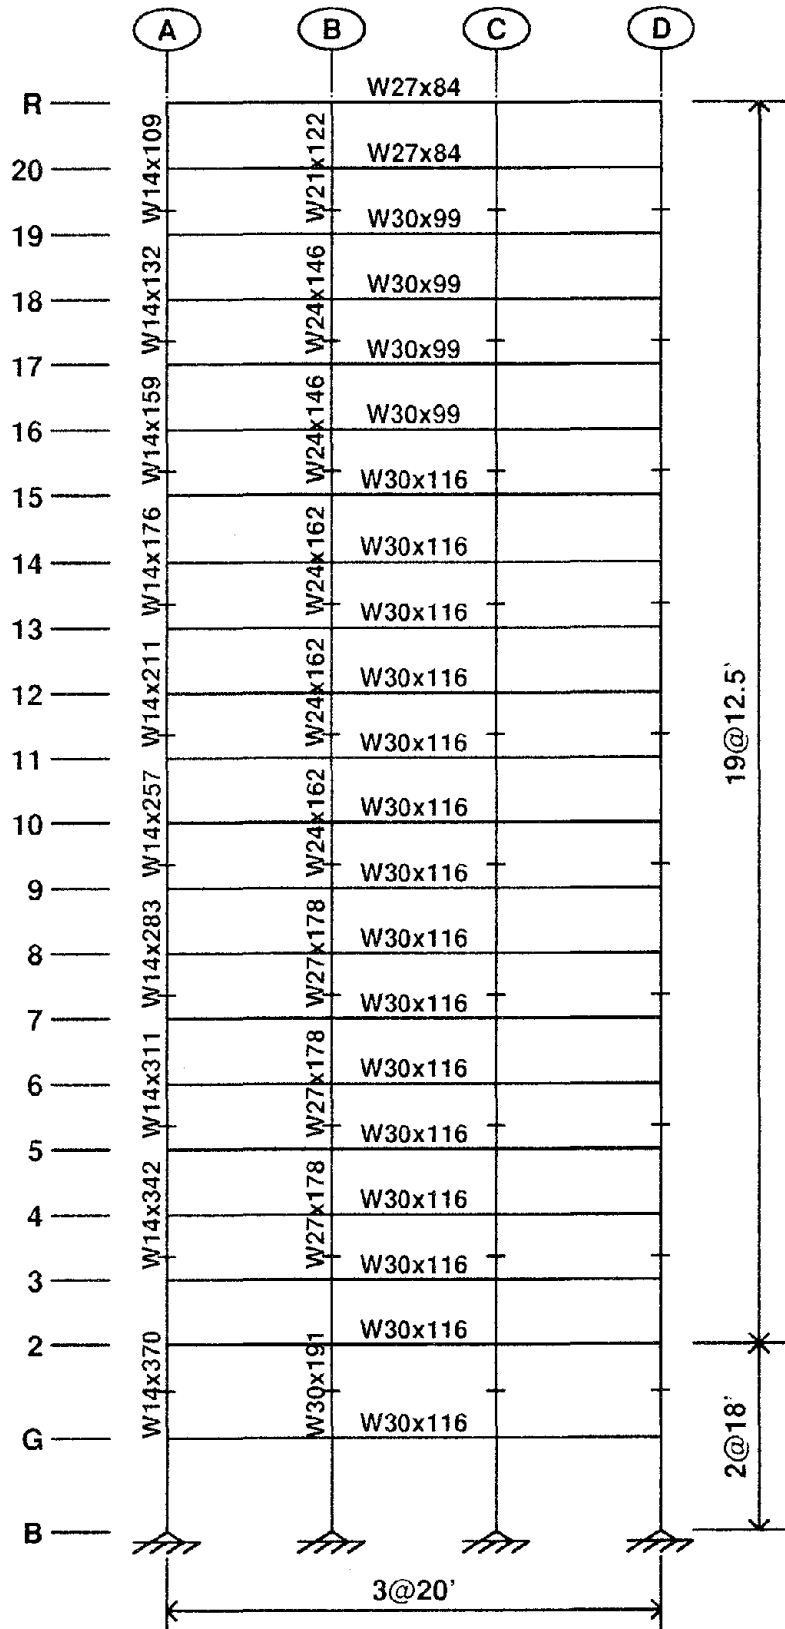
Frame Elevation and Member Sizes for MRF Design 1
